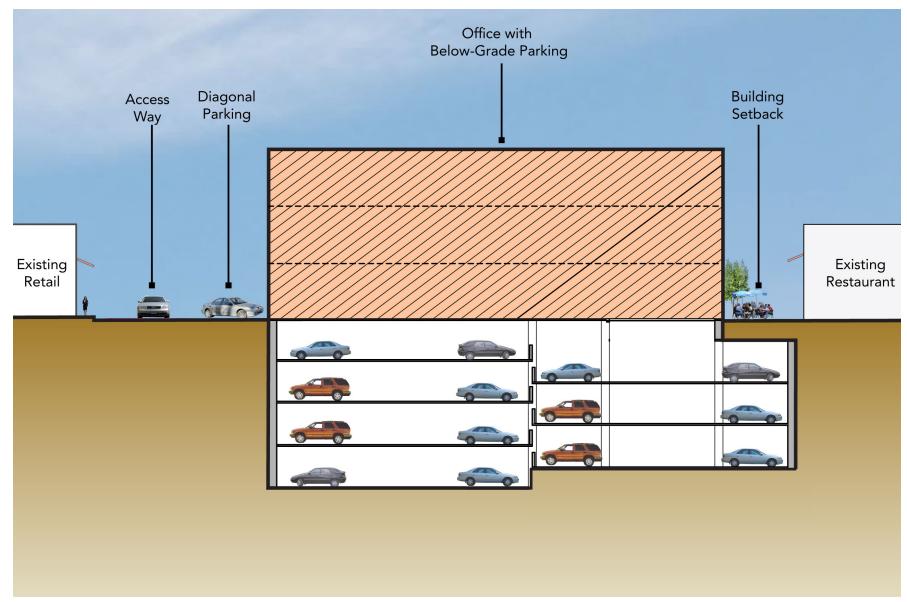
Public-Private Test Case A—Cross Section of Office Building with Below-Grade Parking, Plaza 3 Shown
